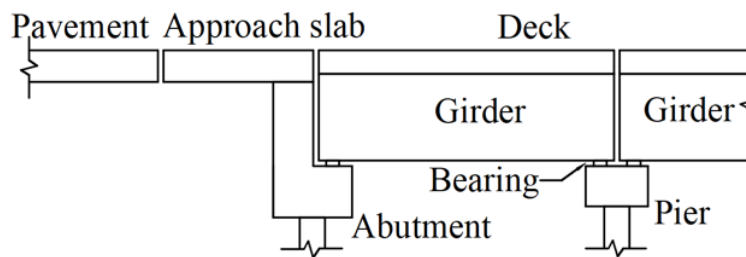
A scheme of conventional jointed bridge-pavement systems.
